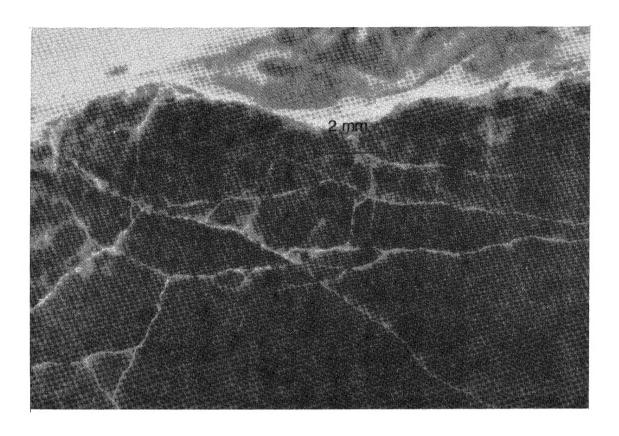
Specimen 940009. Cross-sectional view showing severe fracturing of limestone coarse aggregate particle near the top surface of the specimen. 11X
